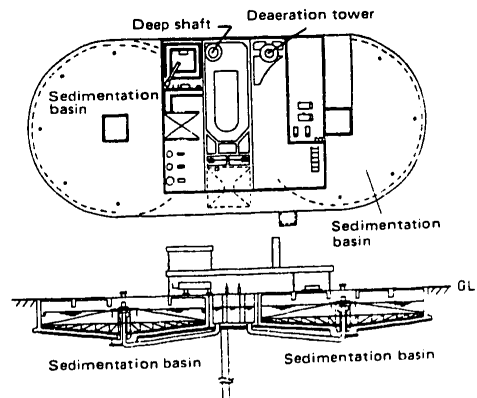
Structure of a Drainage Treatment Plant Using New Deaeration Equipment
